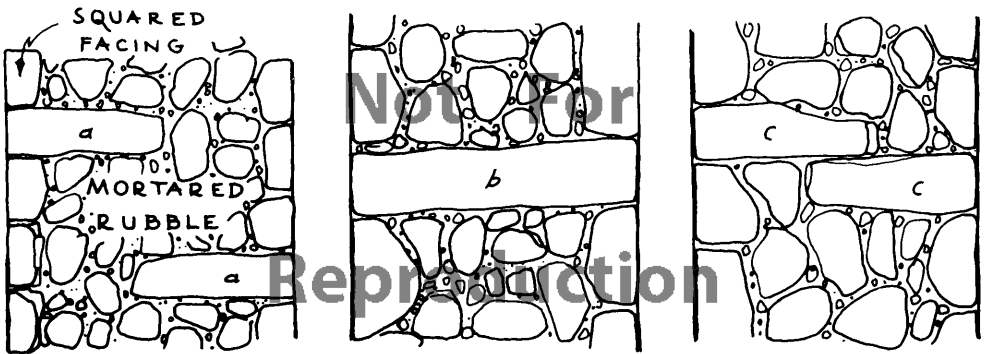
Plans of rubble wall construction showing devices for bonding faces to core
